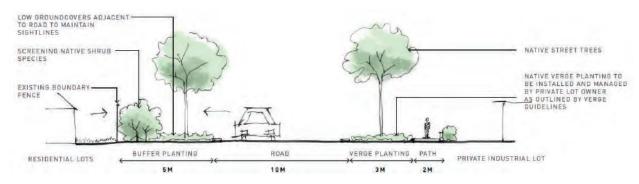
Cross section - Landscape buffer planting and spatial setback of light industrial businesses (Plan e)
